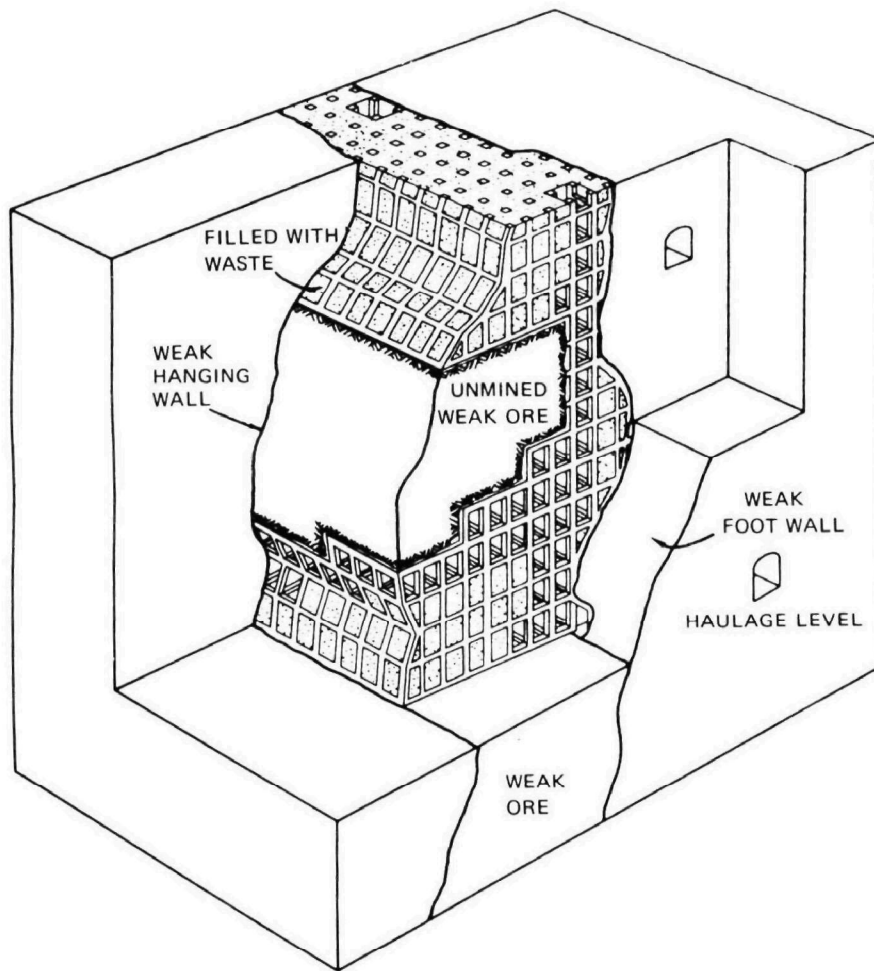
Square-set mining methods used under conditions requiring maximum support for ore and walls (Lewis and Clark, 1964).
